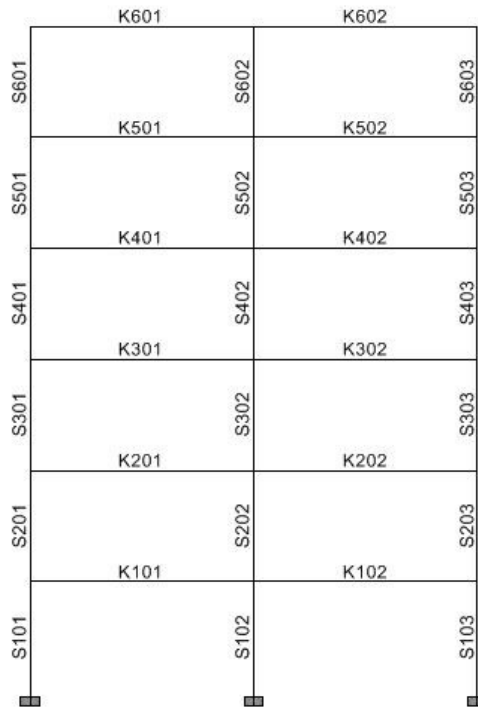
Beam and Column Labels of Structural System Models (6 Story)
